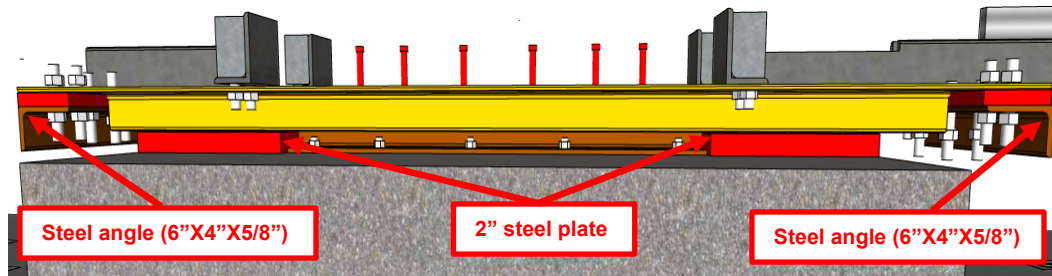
Sideview of the assembly of applying the double shear forces on the connection.
